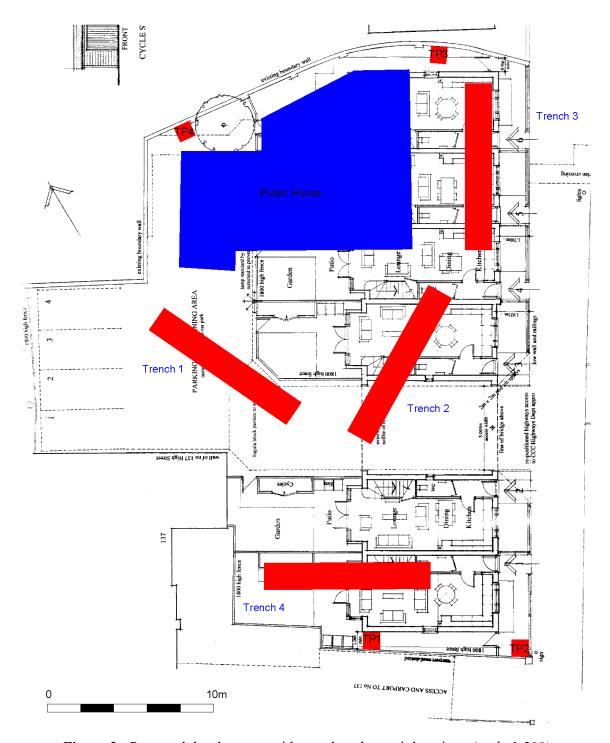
Proposed development with trench and test pit locations (scale 1:200)
